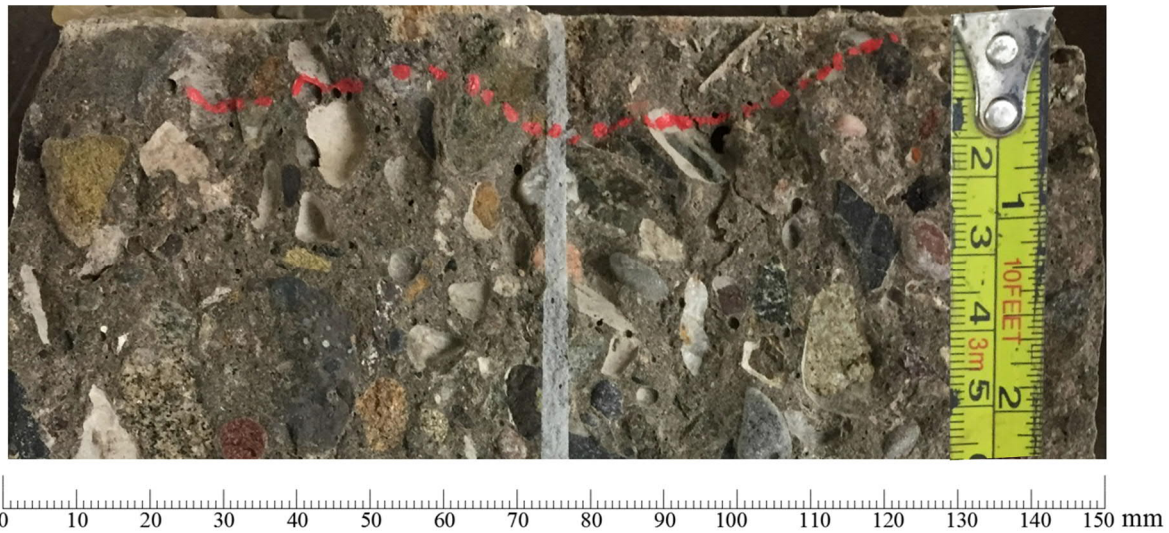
Typical shape of water ingress through hard-hard concrete bond
